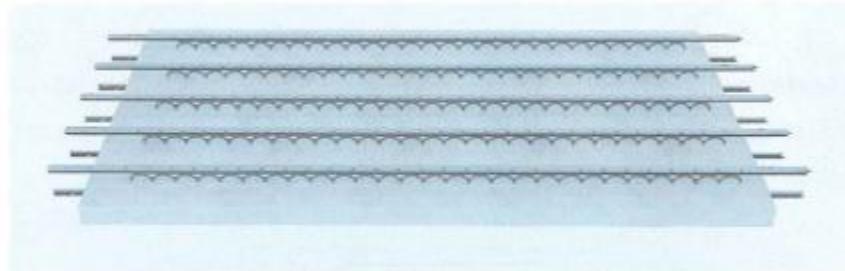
Schematic diagram of M-type light steel concrete composite slab precast bottom plate (works of the company)
